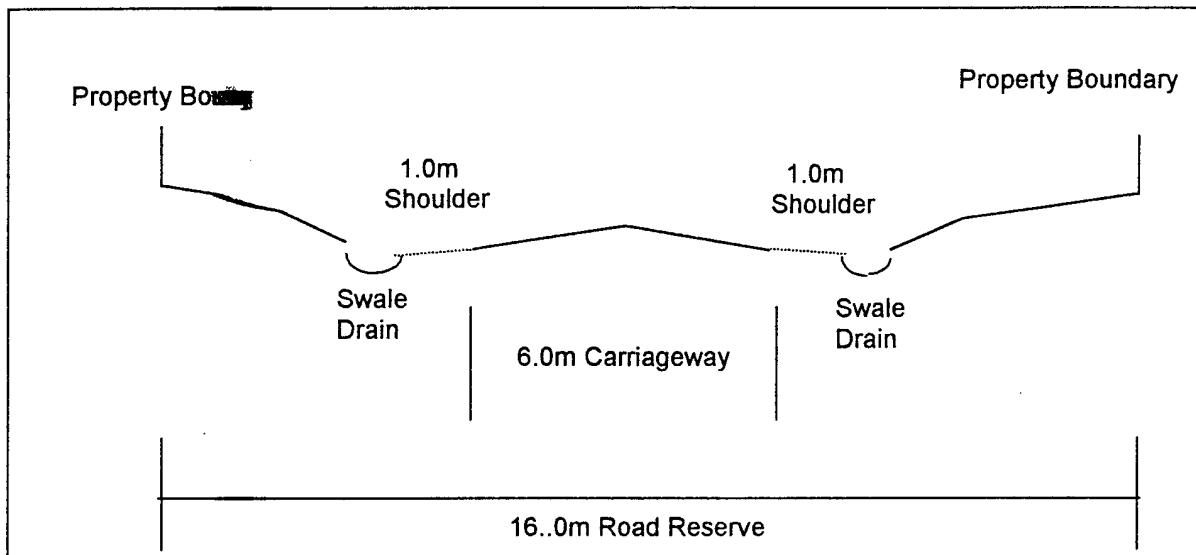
Typical Road Reserve (Potential) - Not To Scale
